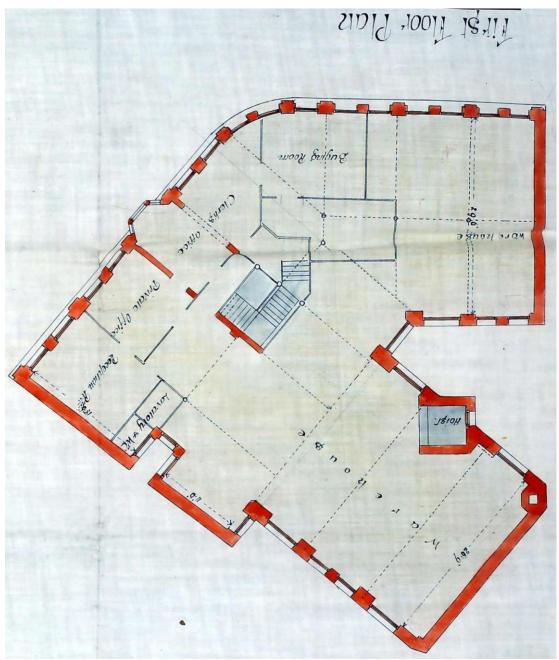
Detail of first floor plan from the 1897 proposals ROLLR 1897/4848. North approximately to top of page
